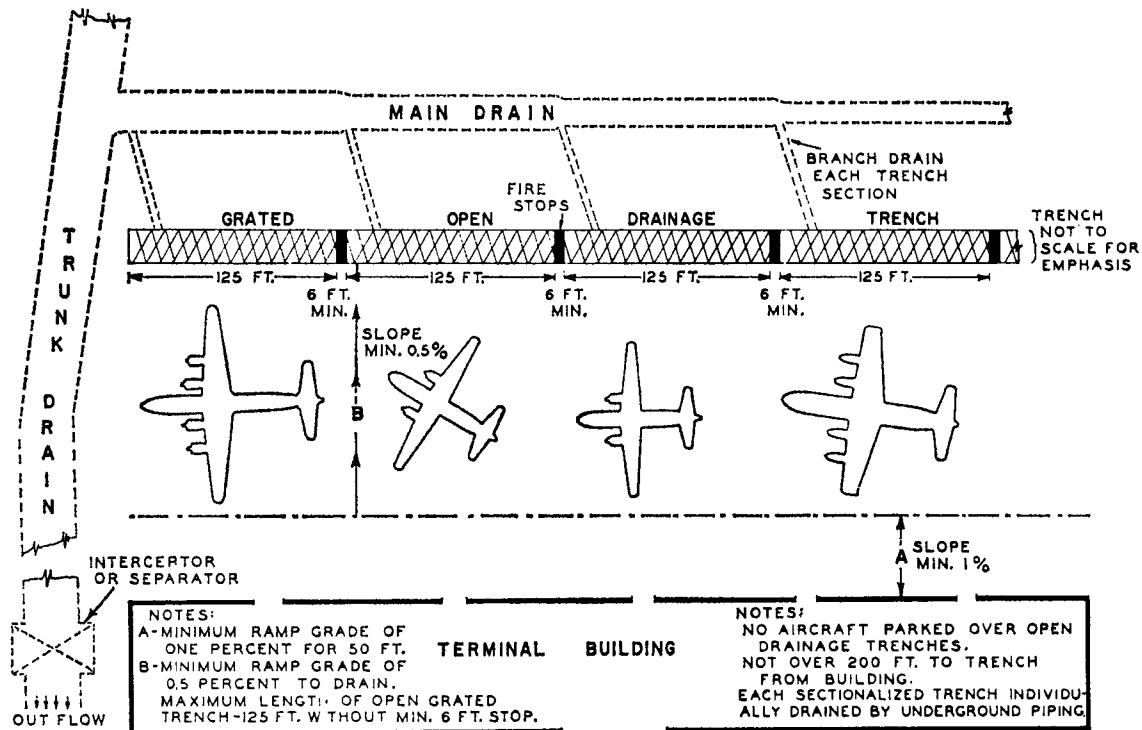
Another possible arrangement of an aircraft fueling ramp drainage system using a grated open drainage trench.
